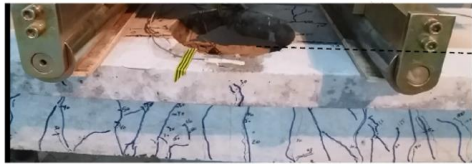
Crack patterns of a beam with a vertical circular opening [13]
